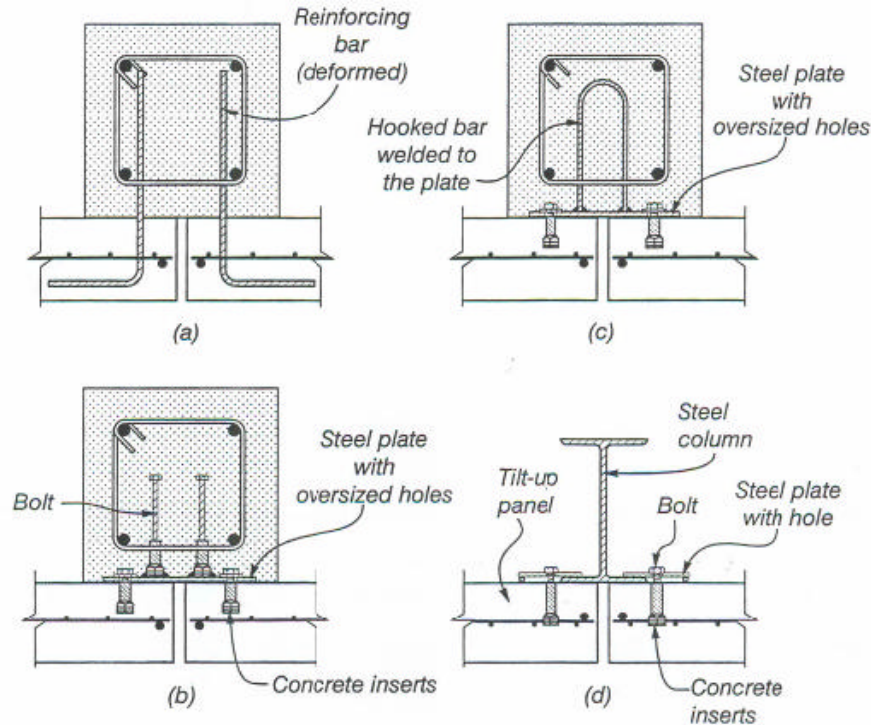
Typical connection details between wall panels and steel or reinforced concrete columns (Restrepo *et al.*, 1996)
